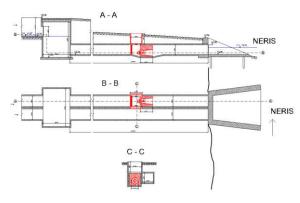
Preliminary layout of installing a submersible, modular turbine into an underground concrete chamber. Vilnius WWTP (V2). Receiving water body – the Neris River
